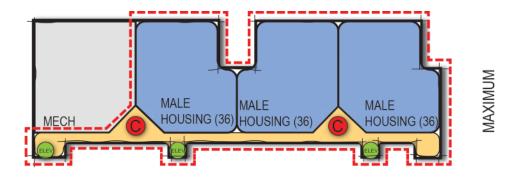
Preliminary OCCC High Rise Floor Plan
